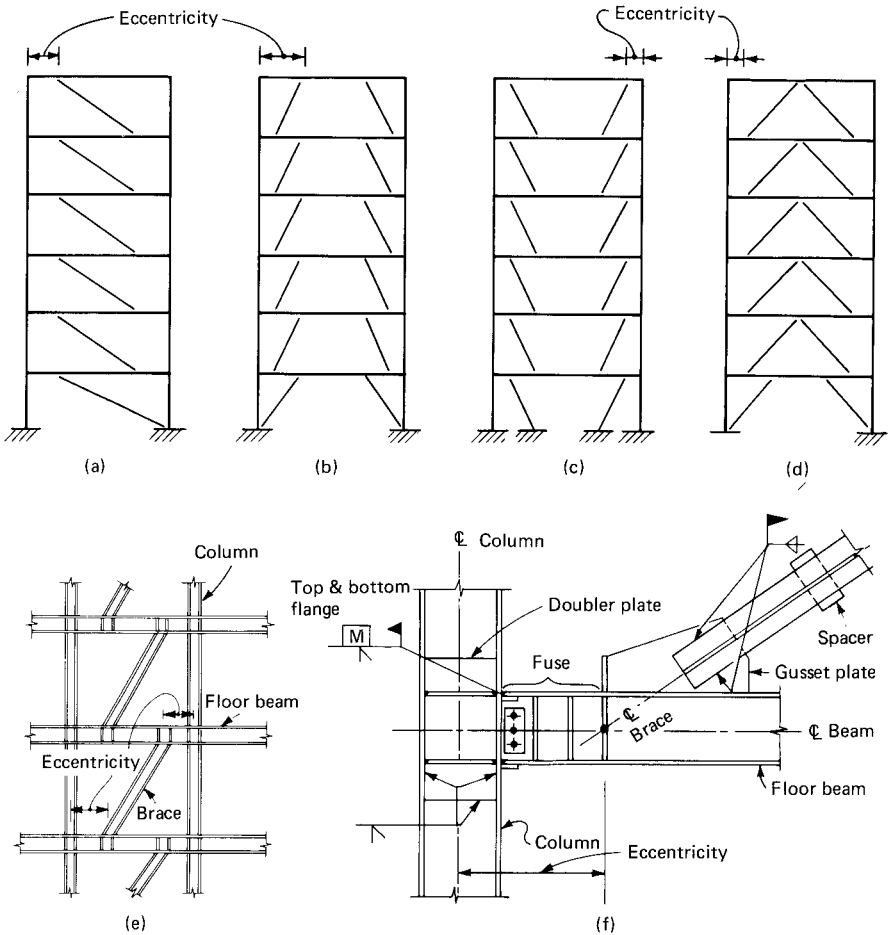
Eccentric bracing system. (a to d) Common types of bracing; (e) schematic elevation; (f) schematic detail.
